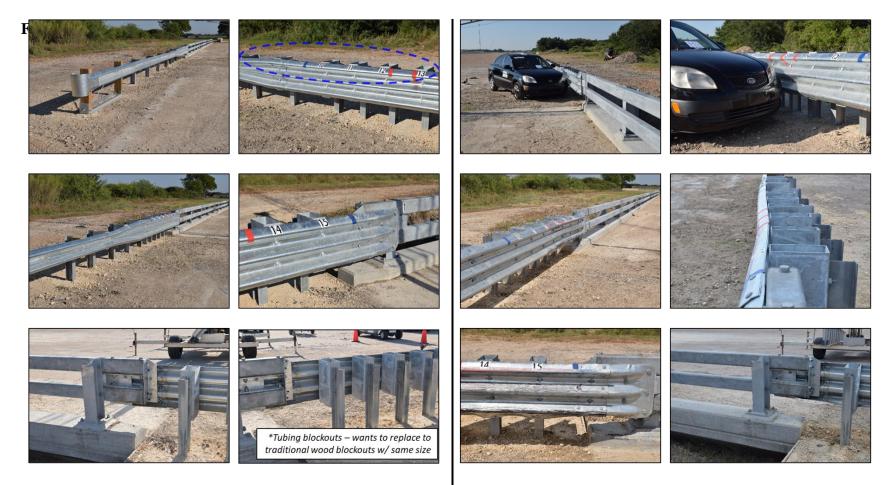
Alaska 2-Tube Bridge Rail Thrie Beam Transition prior to Testing
